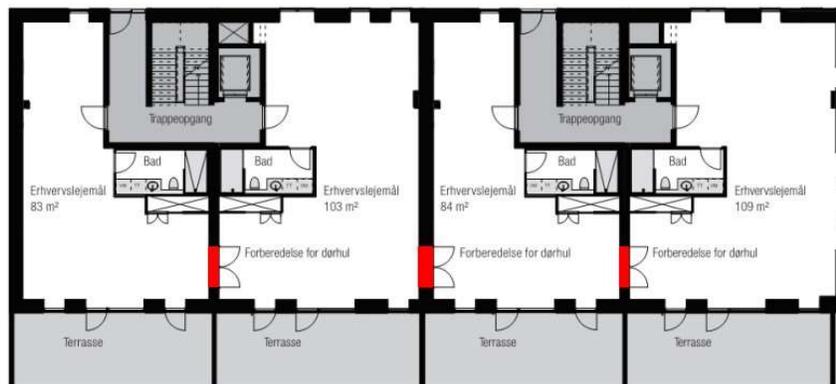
Kanalfronten, office plan³². Red illustrates the part of the walls that are prepared for door openings.
